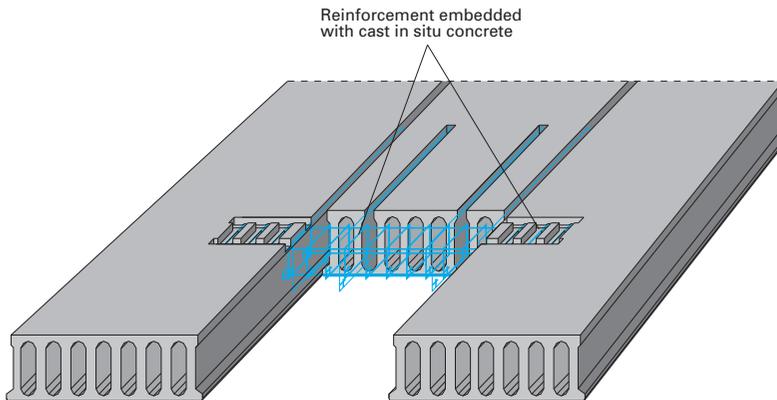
Example of a reinforced concrete beam cast in situ to support hollow core slabs involved in a large opening.
